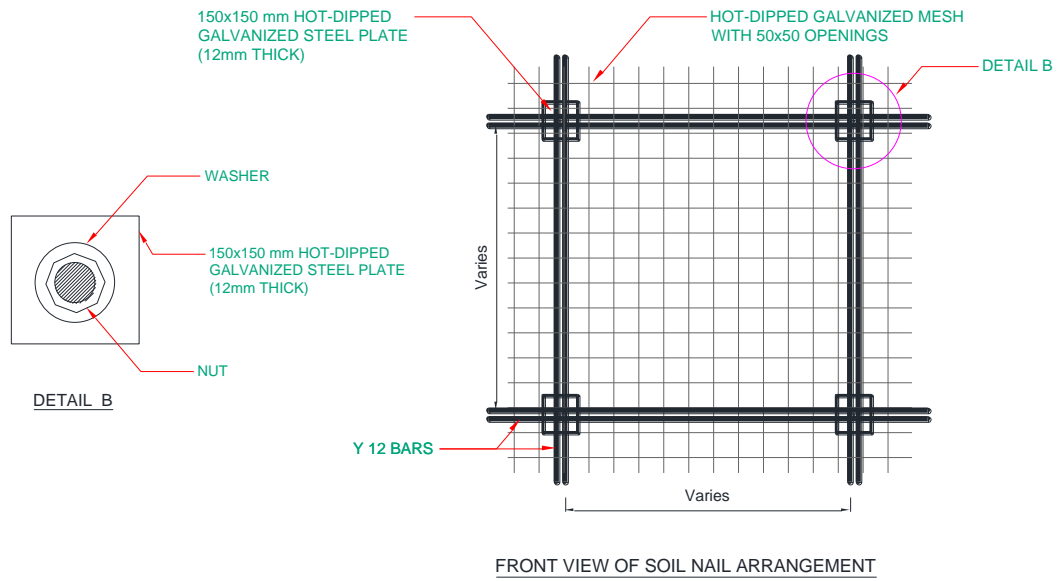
Typical details of shotcrete facing used in Sri Lanka (after NBRO design documents)
